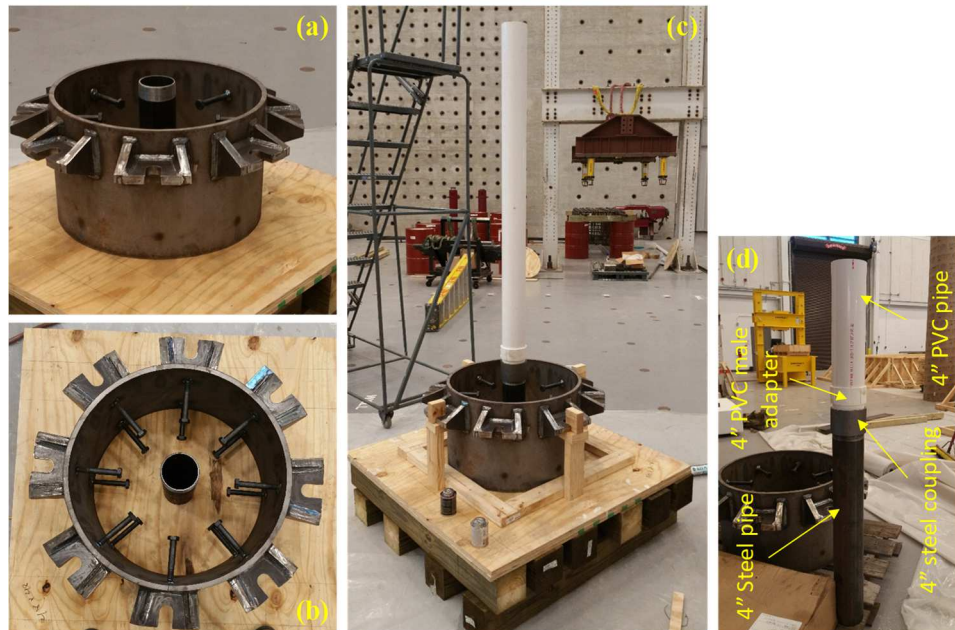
Construction steps for RC segment with steel collar: (a) steel collar and central steel pipe; (b) plan view of steel collar and central steel pipe; (c) central pipe assembled; (d) details of the central pipe assembly.
